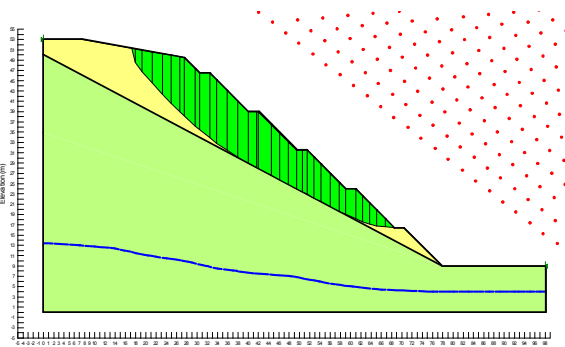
Shape of typical failure surface - two layers of soil slope at initial stage
